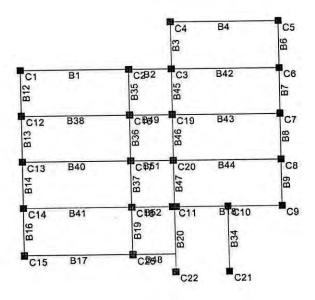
Plan of a typical cyclone shelter funded by the European Union
